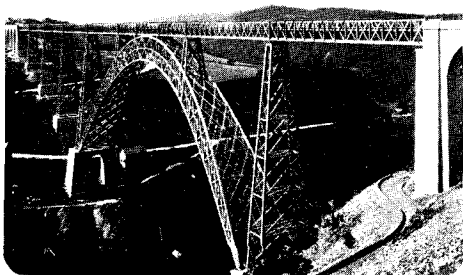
Eiffel's bridge at Garabit, in which he perfected the design principles later used in the Tower. Note that as the arch widens in plan, it narrows in section.
